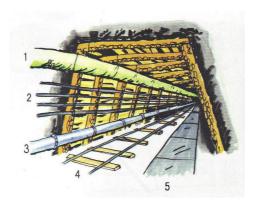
Underground mine (1 - Ventilation duct; 2 - Electric power cable; 3 - Water pipeline, 4 - Railway, 5 - Walkway for workers)
